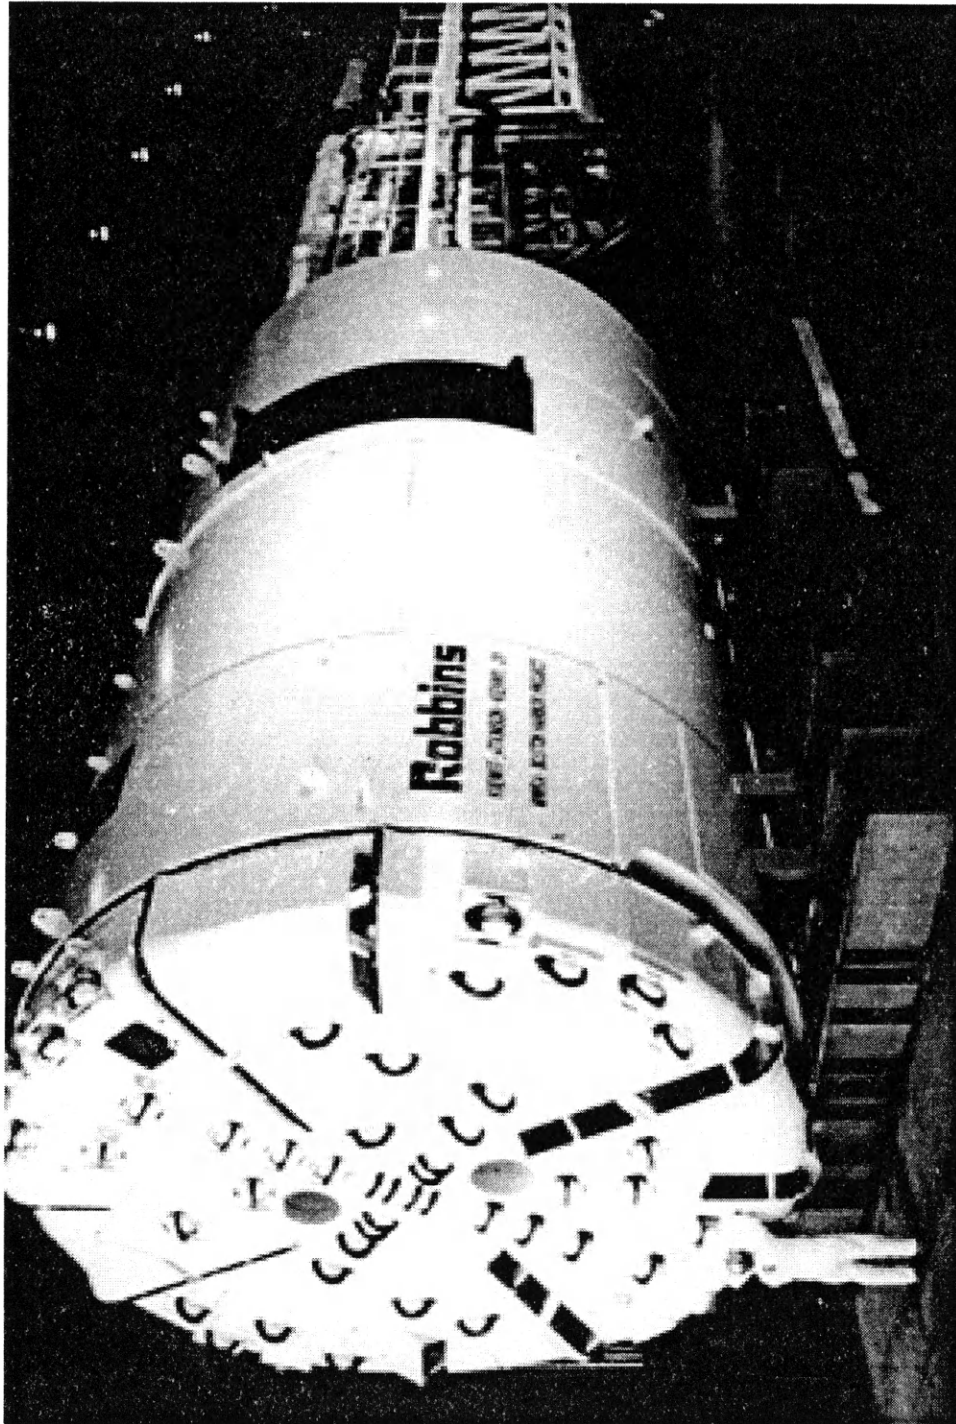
Photograph of Tunnel Boring Machine used in Outfall project
